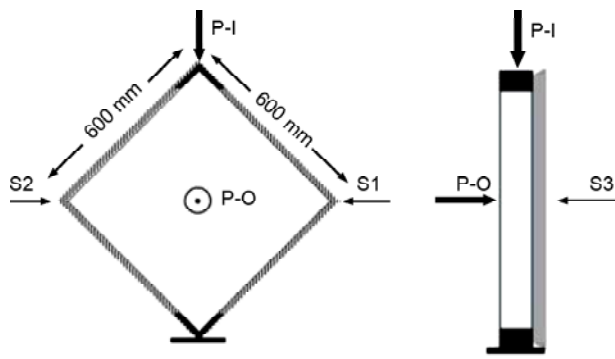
Position of loading jacks (P) and LVDT sensors (S).
